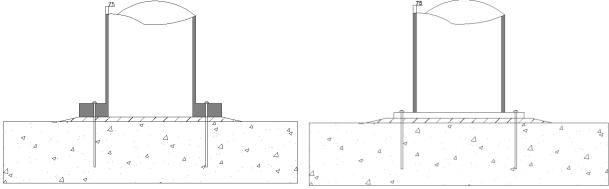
Segment-foundation connection: Bolted concrete (L) & bolted steel plate (R)
